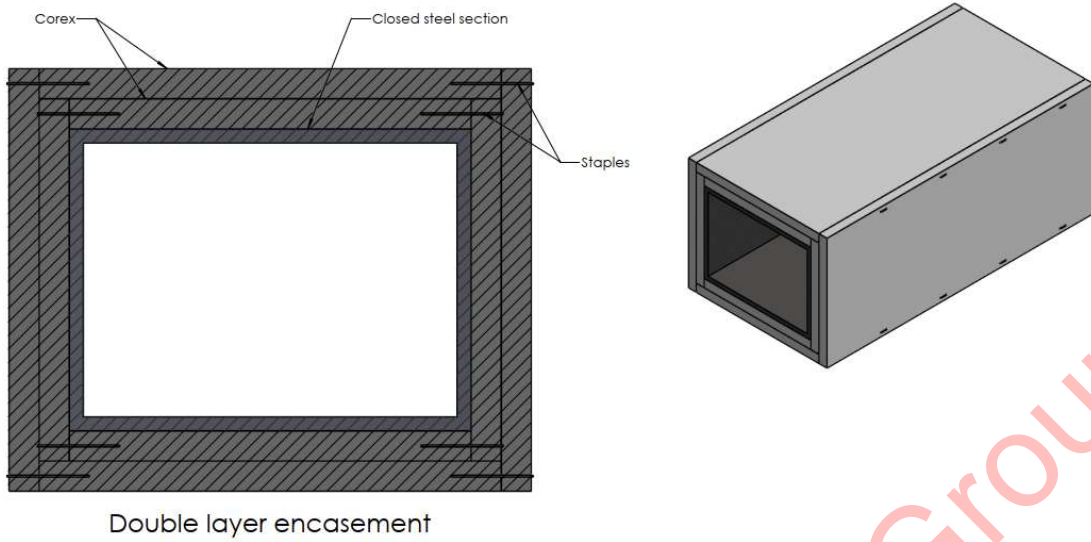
Double layer encasement on hollow section beams and columns – 4 sided
